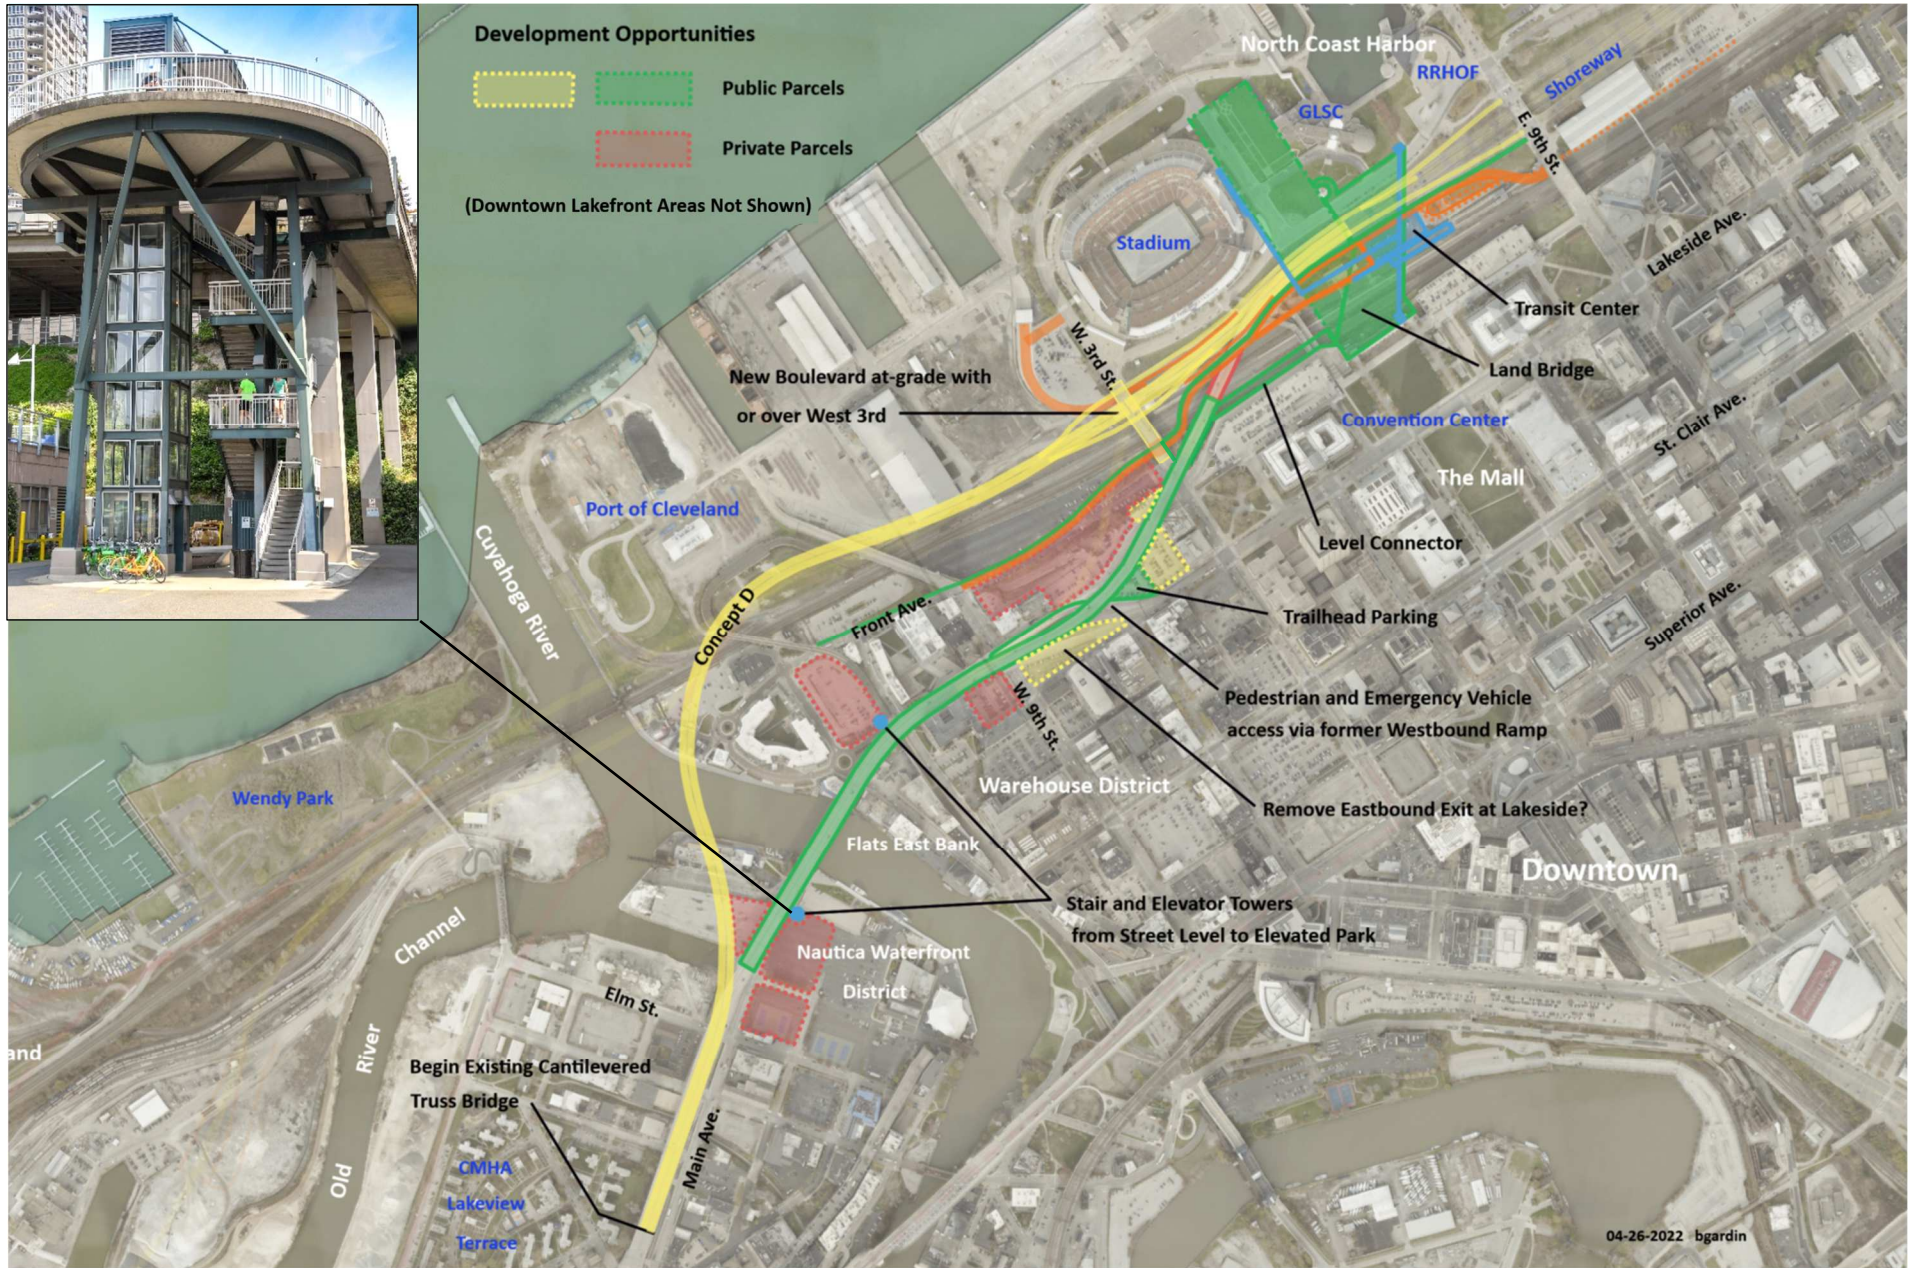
Concept Plan D with photo example of a stair and elevator tower
